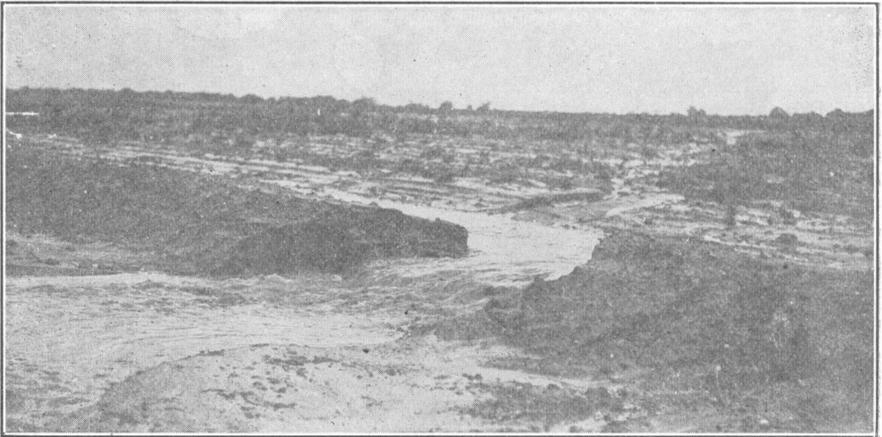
The break in this terrace caused by an insufficient outlet occurred 20 feet from the outlet after the water had been carried 1200 feet. The two foot outlet through a hog wire fence should have been 8 to 10 feet wide.
